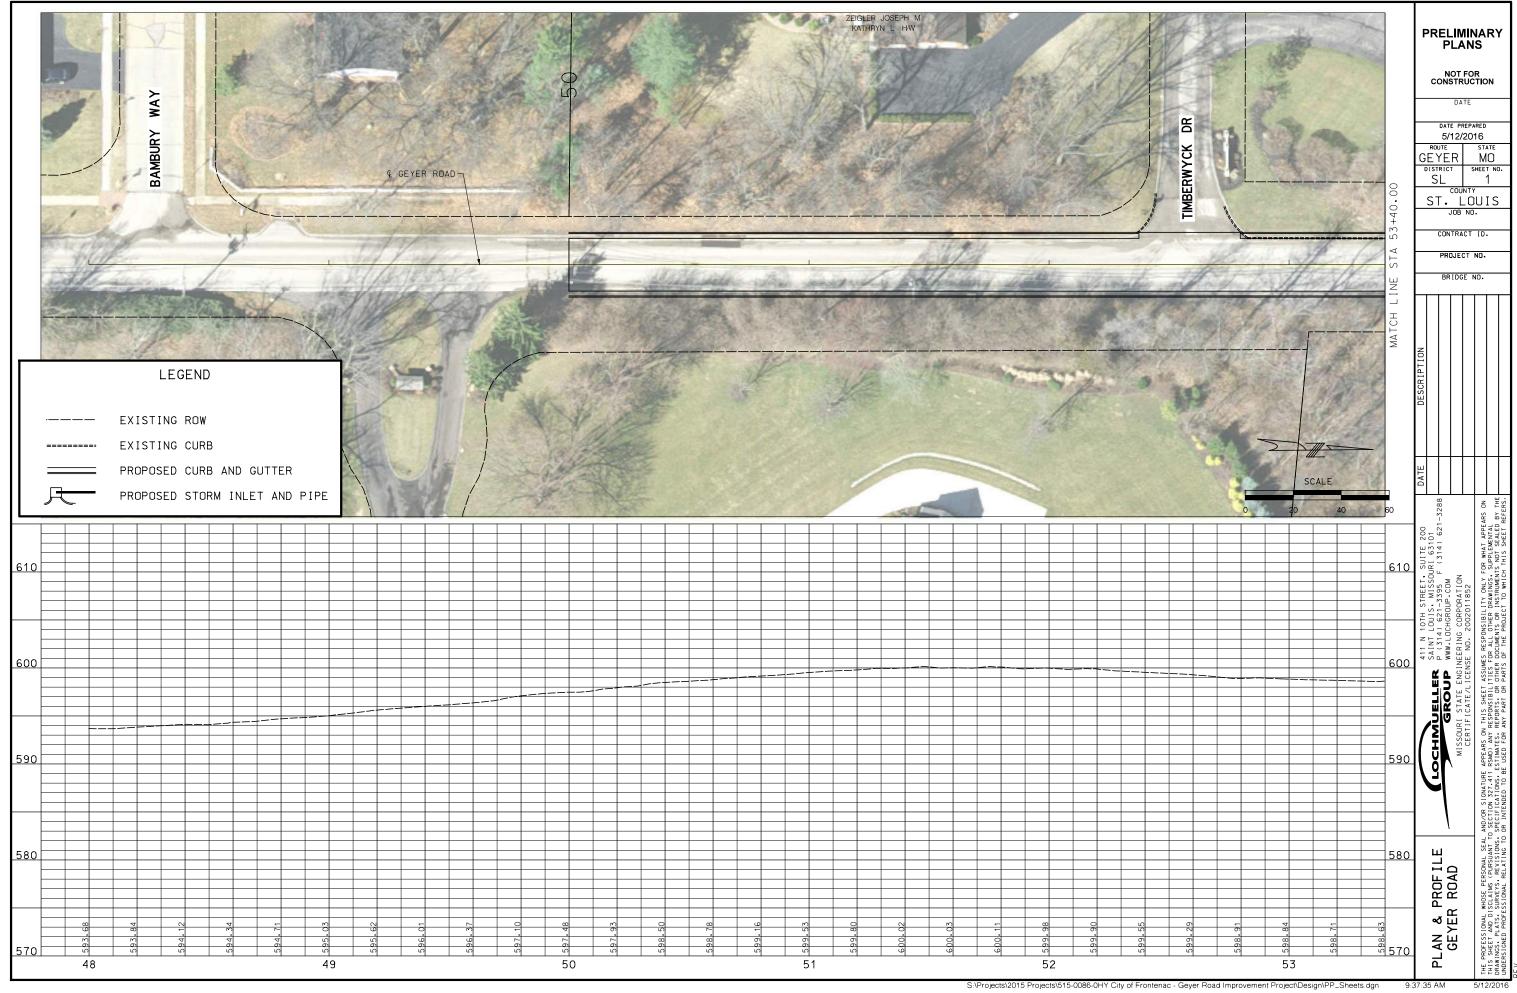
Rendering of Proposed Geyer Road Improvements
